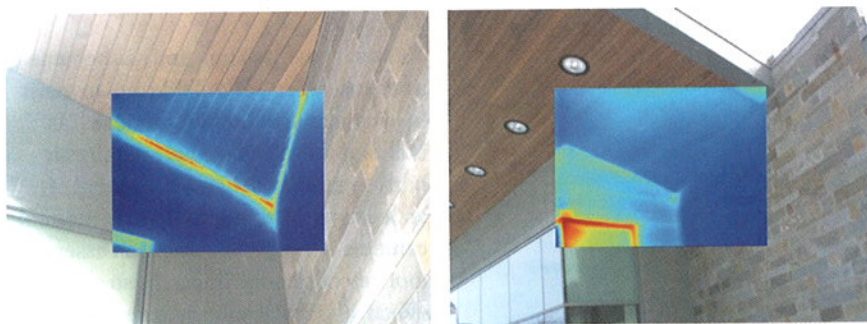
IR images of wall/roof joint before (left) and after foam air sealing (right).
